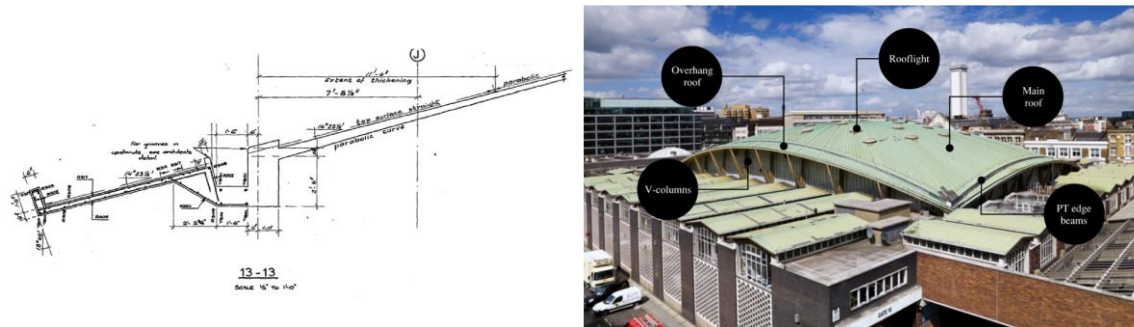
Section through roof edge and overhang (from archive drawings) (left) and roof exterior (right)
